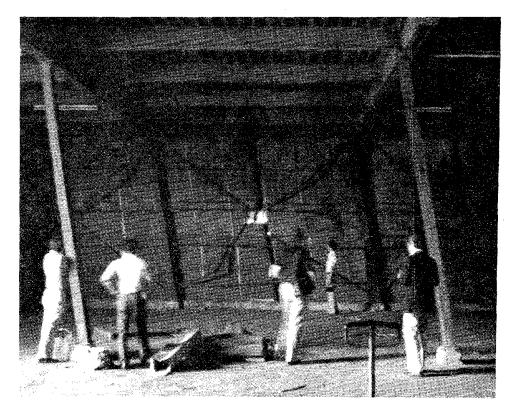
Near failure of a braced frame warehouse, 1978 Sendai Japan earthquake.
